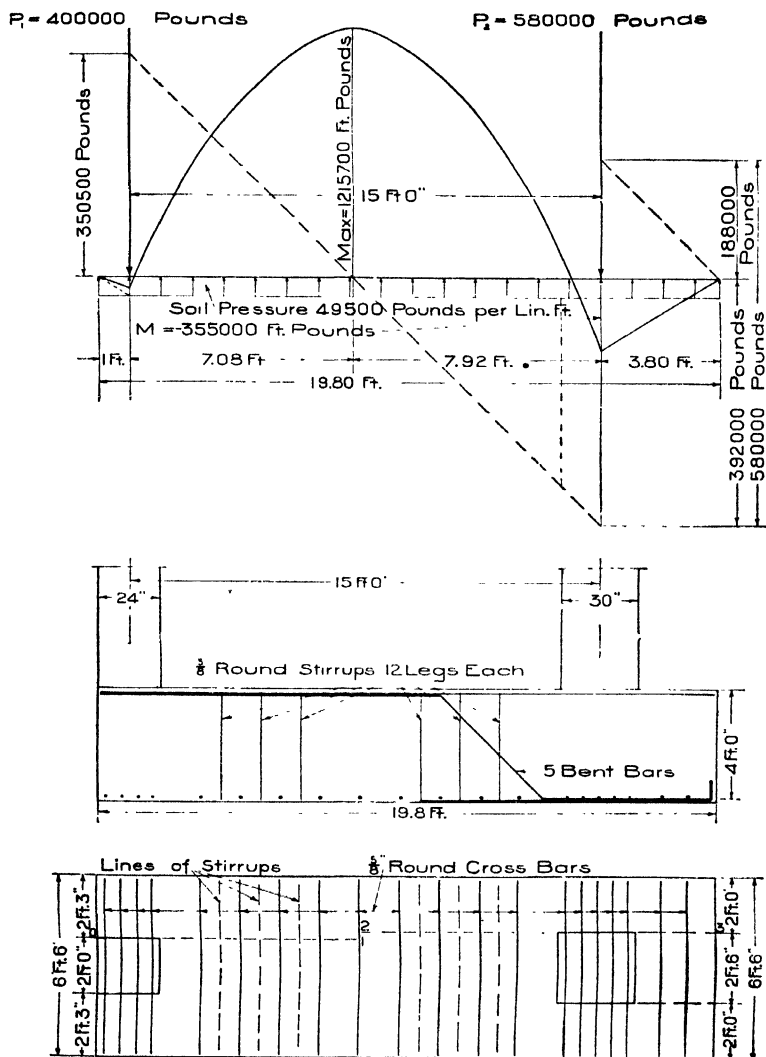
Design of Combined Footing. (See p. 68a.)
